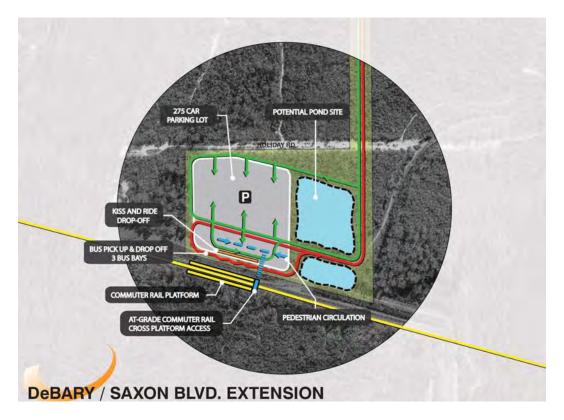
Conceptual Station Site Plan – DeBary/Saxon Blvd Extension
